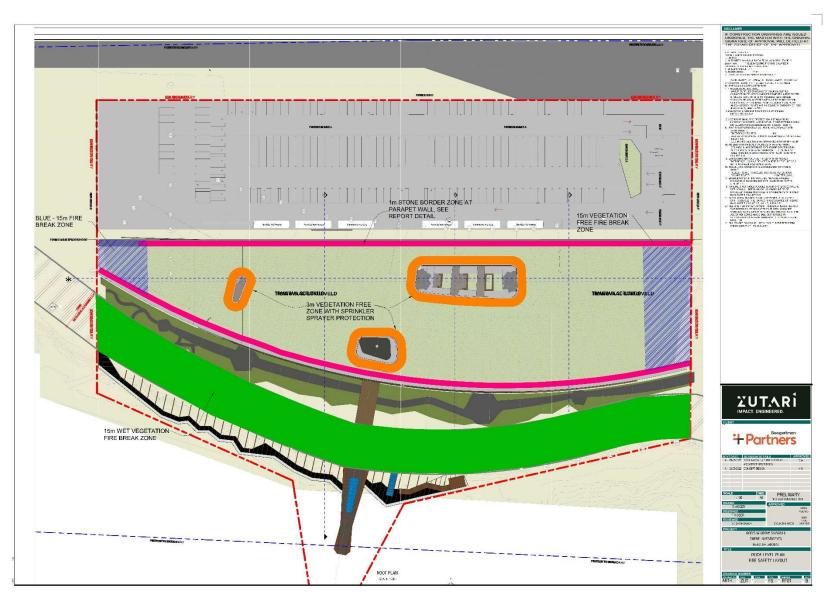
Fire management plan from a rooftop view of the proposed project
